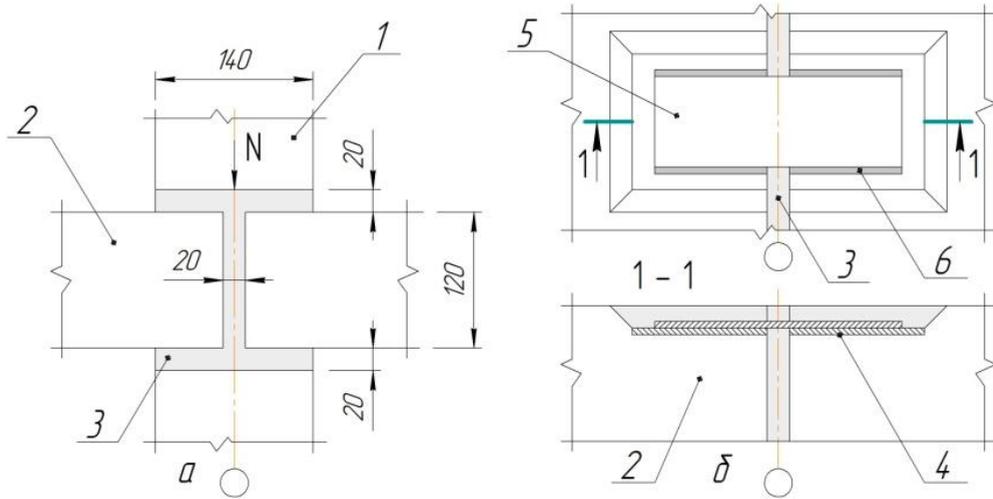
Horizontal platform joint (a), connection on embedded parts in horizontal joint (b): 1 - wall panel, 2 - floor slab, 3 - mortar joint, 4 - embedded part, 5 - connecting strip
